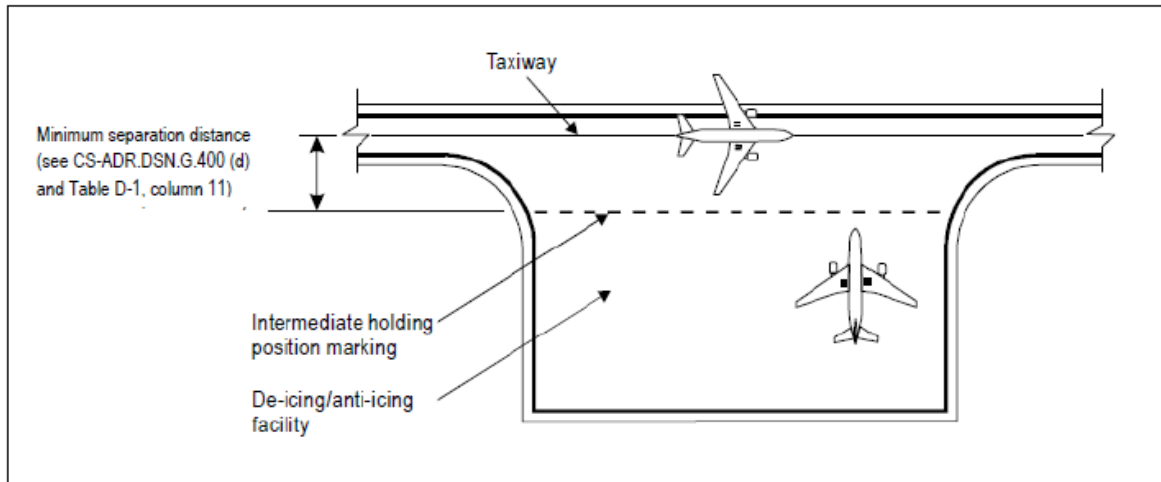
Minimum separation distance on a de-icing/anti-icing facility
